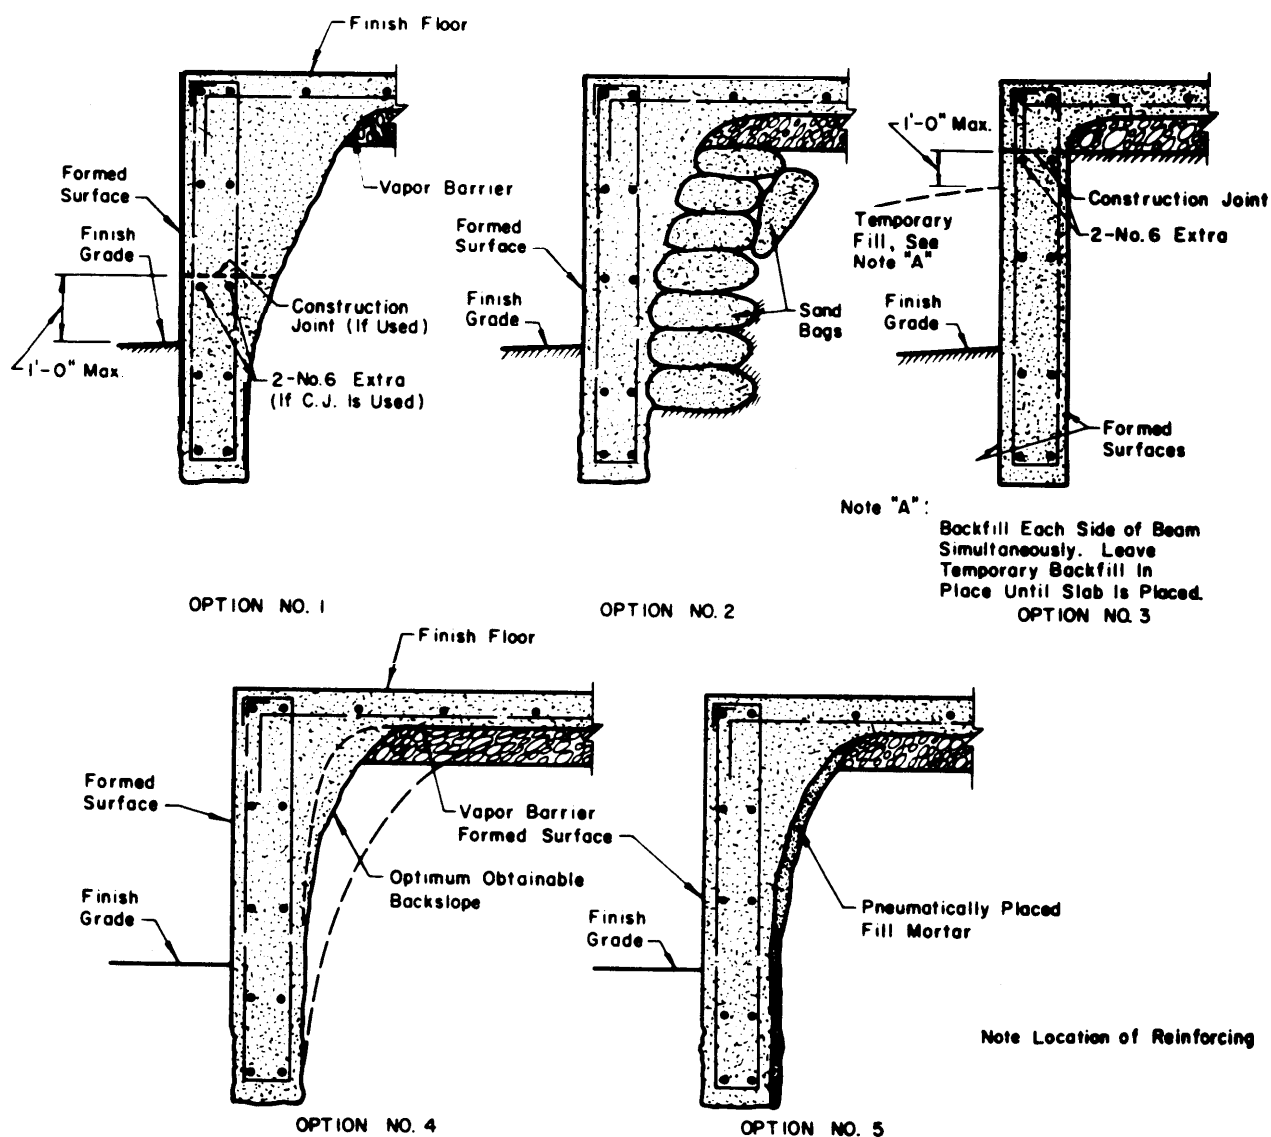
Optional construction details of exterior beams (interior beam similar) for ribbed mat construction.
